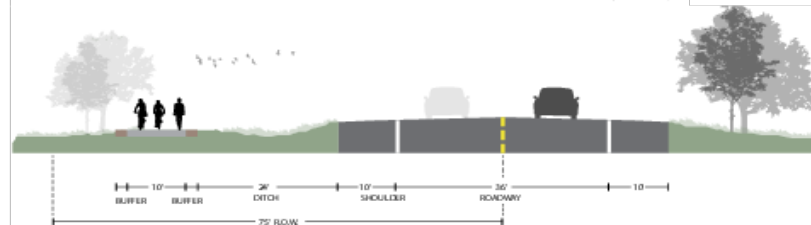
Otter Tail County GET: Typical Adjacent to Roadway Section with 75' ROW (CSAH 1)
